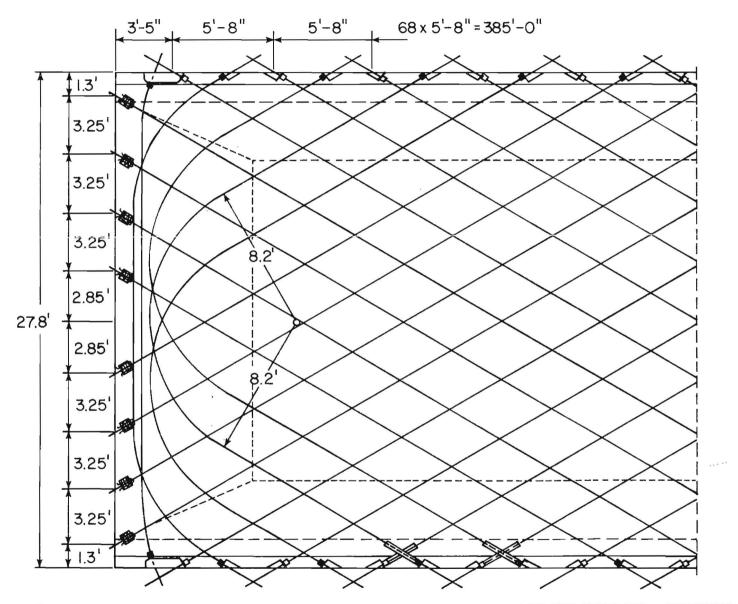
ARRANGEMENT OF TENDONS IN HIGHWAY PAVEMENT AT MERGELSTETTEN, GERMANY
